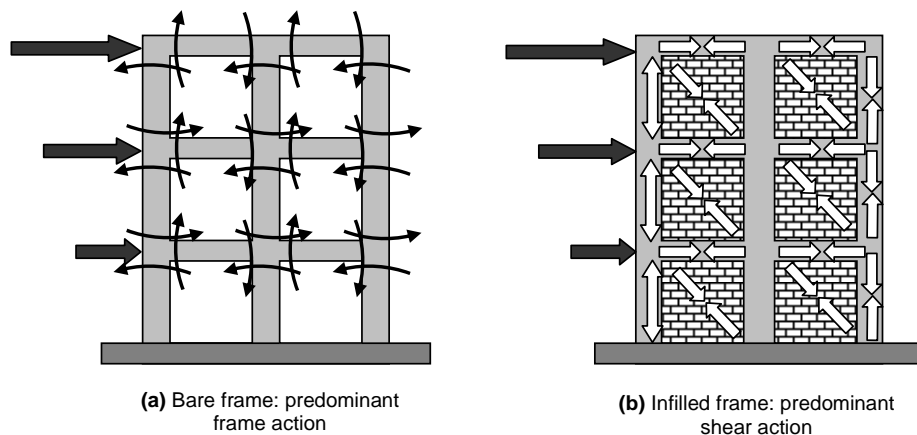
Behaviour of infill frame [Ref. 16.23]
